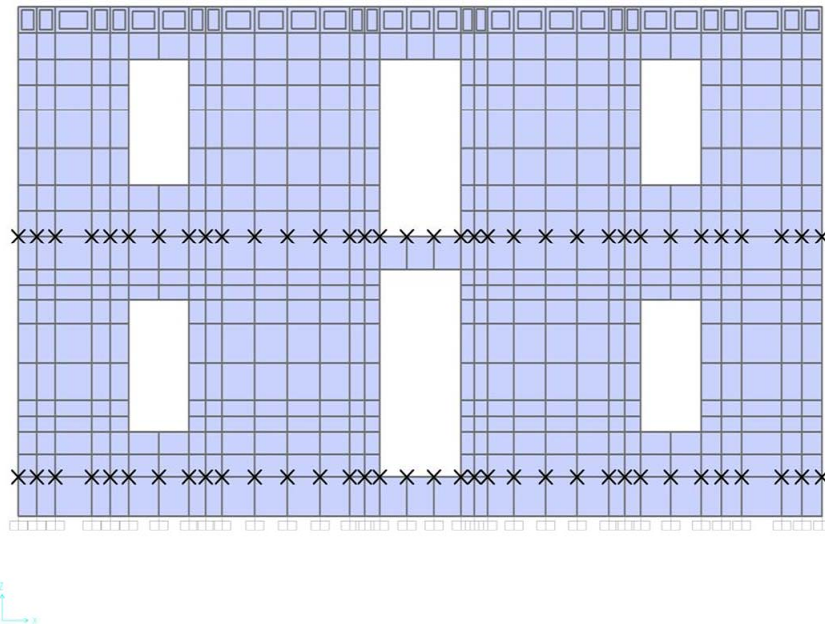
Indicative façade where are visible the levels of reinforced concrete slabs and the bond beam as simulated
